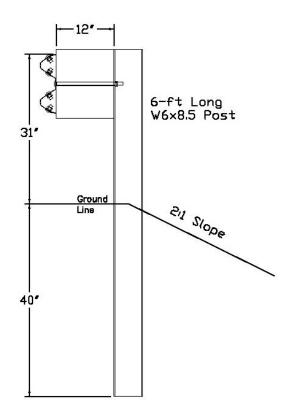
Barrier Installation, Test Nos. MGSS-1 [20]
